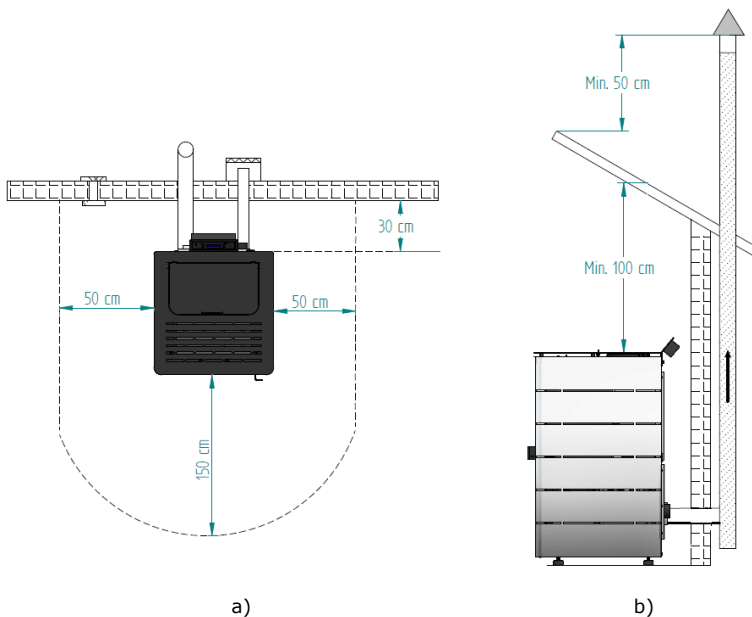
Minimum distances from all surfaces: (a) top view of the installation of the equipment; (b) side view of the installation of the equipment
